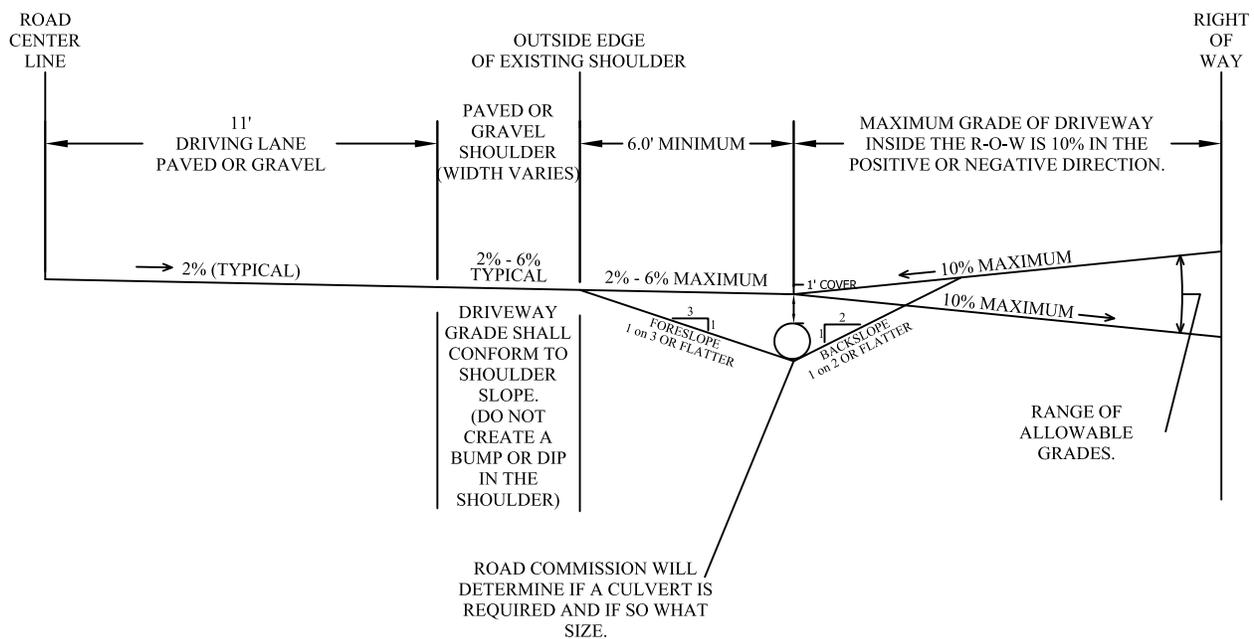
DRIVEWAY PROFILE OTHER THAN COMMERCIAL
